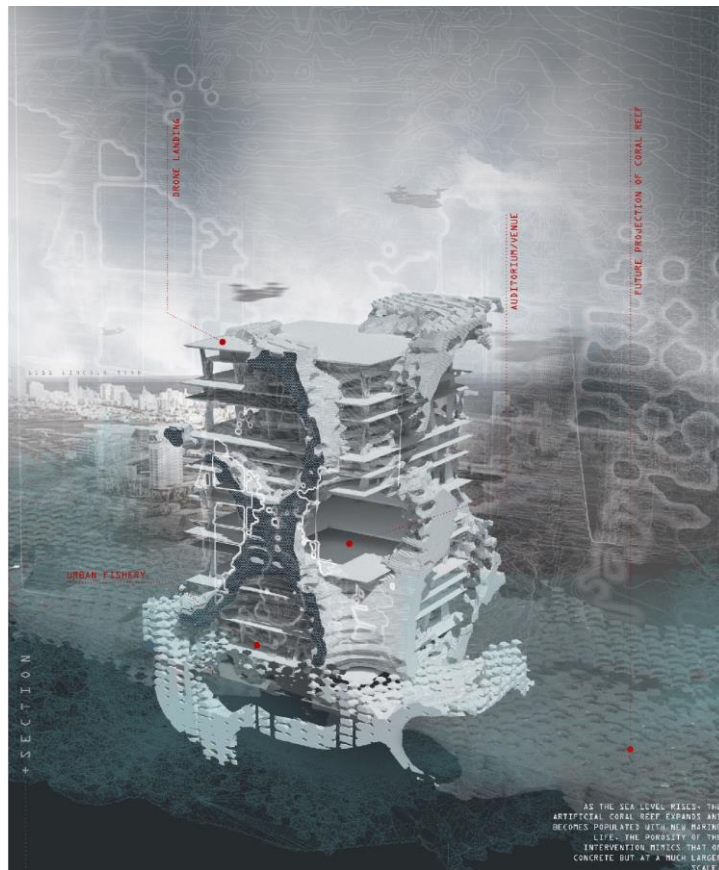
Conceptual section perspective | 1111 Lincoln Road Parking Garage addition, Miami Beach. Student work, source: by author
